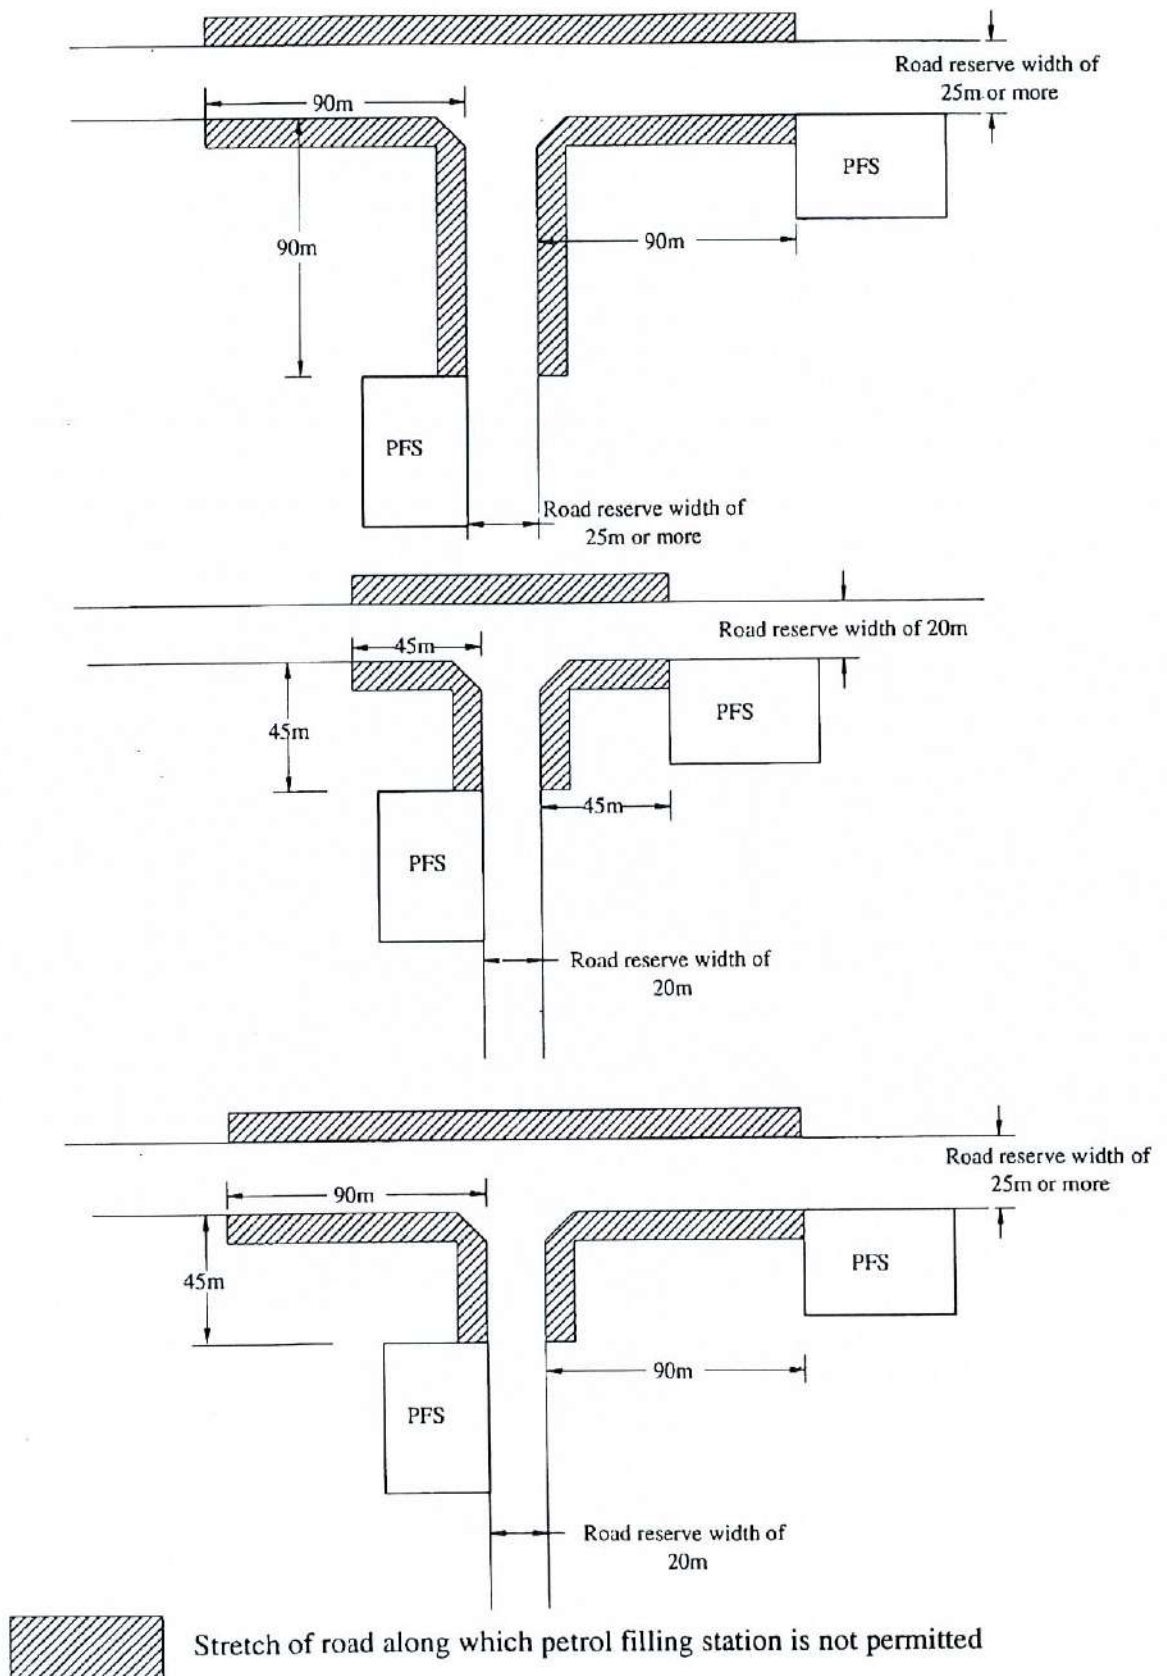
SITING OF PETROL FILLING STATION NEAR ROAD JUNCTION
